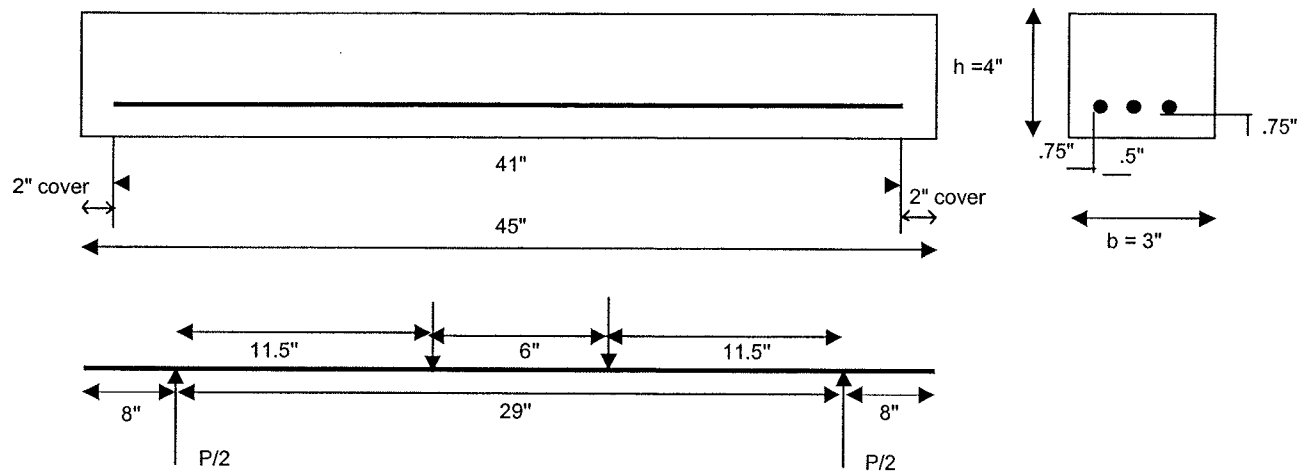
Details of reinforcement position and testing arrangement (BRC-2).
